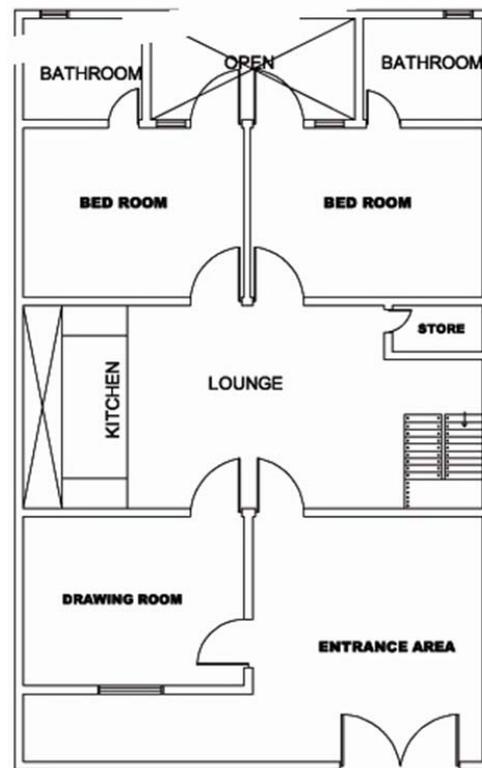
Typical 400 sq yards house plan - Gulshan Town, Karachi.
